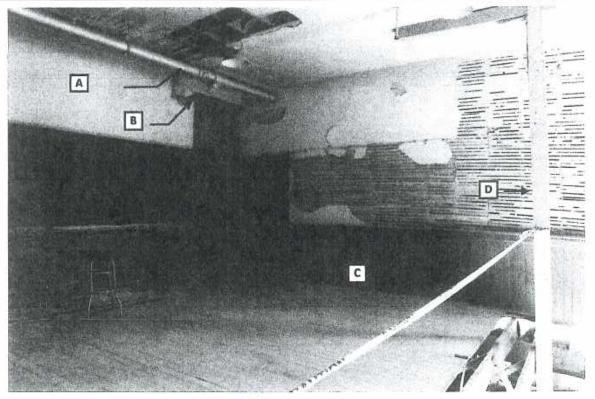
Room 3 view northeast. (A) Steam pipe, (B) Bell, (C) V-groove wainscot, (D) Shoring pier per 2010 structural retrofit.
